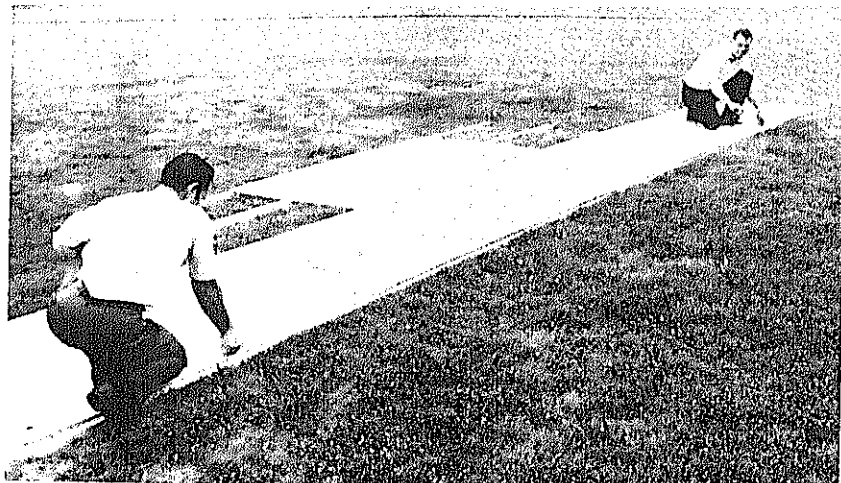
Truss shape being laid out on the plywood deck. Bottom of truss is marked with a chalk line.
